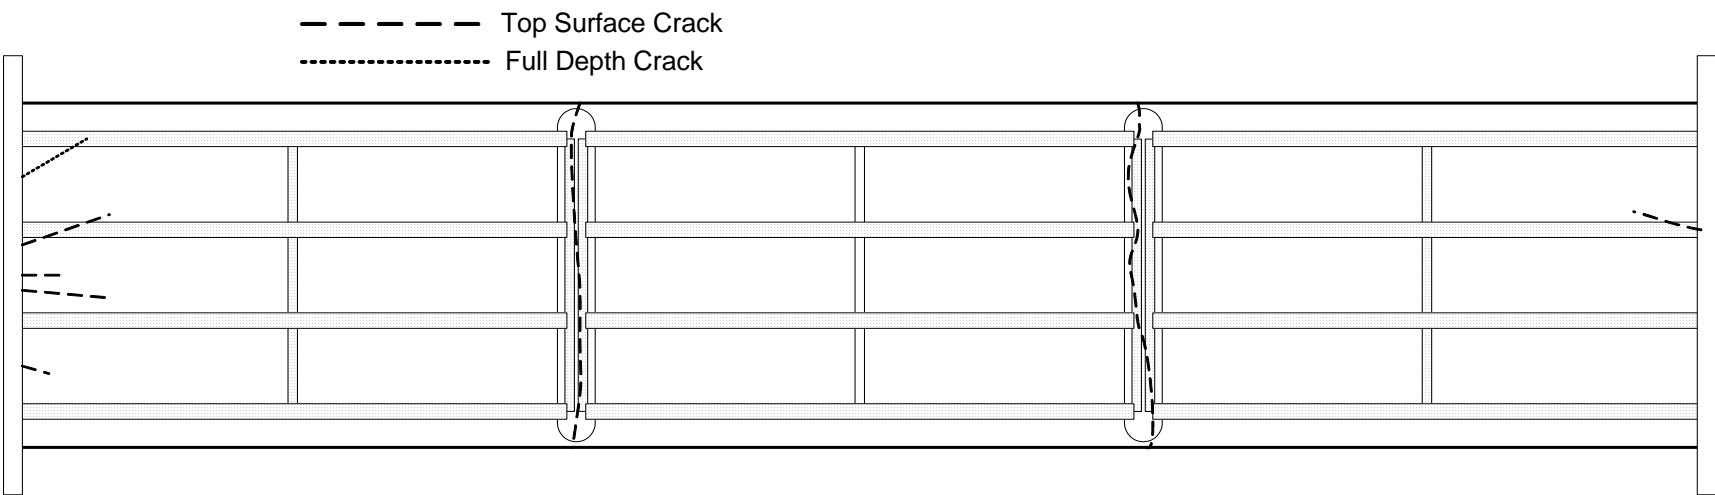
Detailed Map of Crack Survey on the Conventional Bridge Deck
